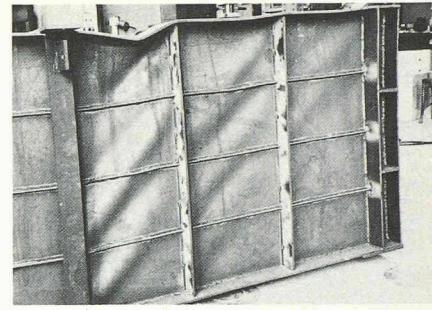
Typical collapse of a girder with three longitudinal stiffeners.
